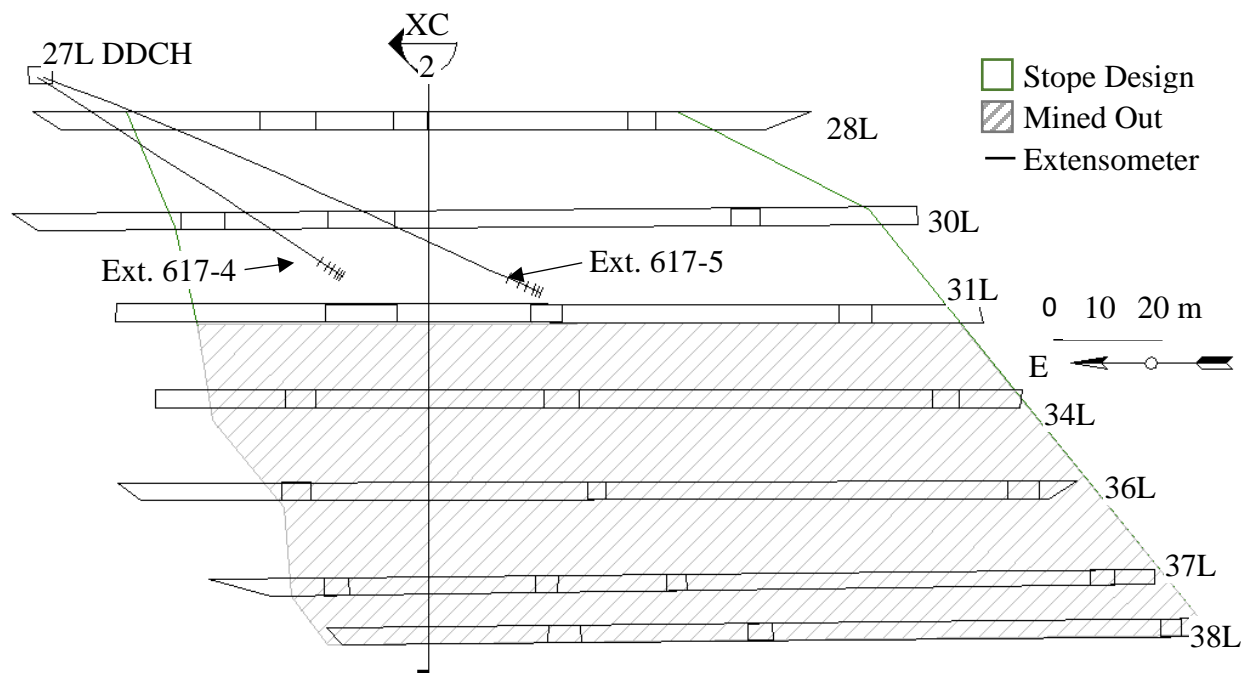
Long view of the longhole panel hanging wall looking south and showing level developments, panel outlines, mined out areas, and extensometer locations.
